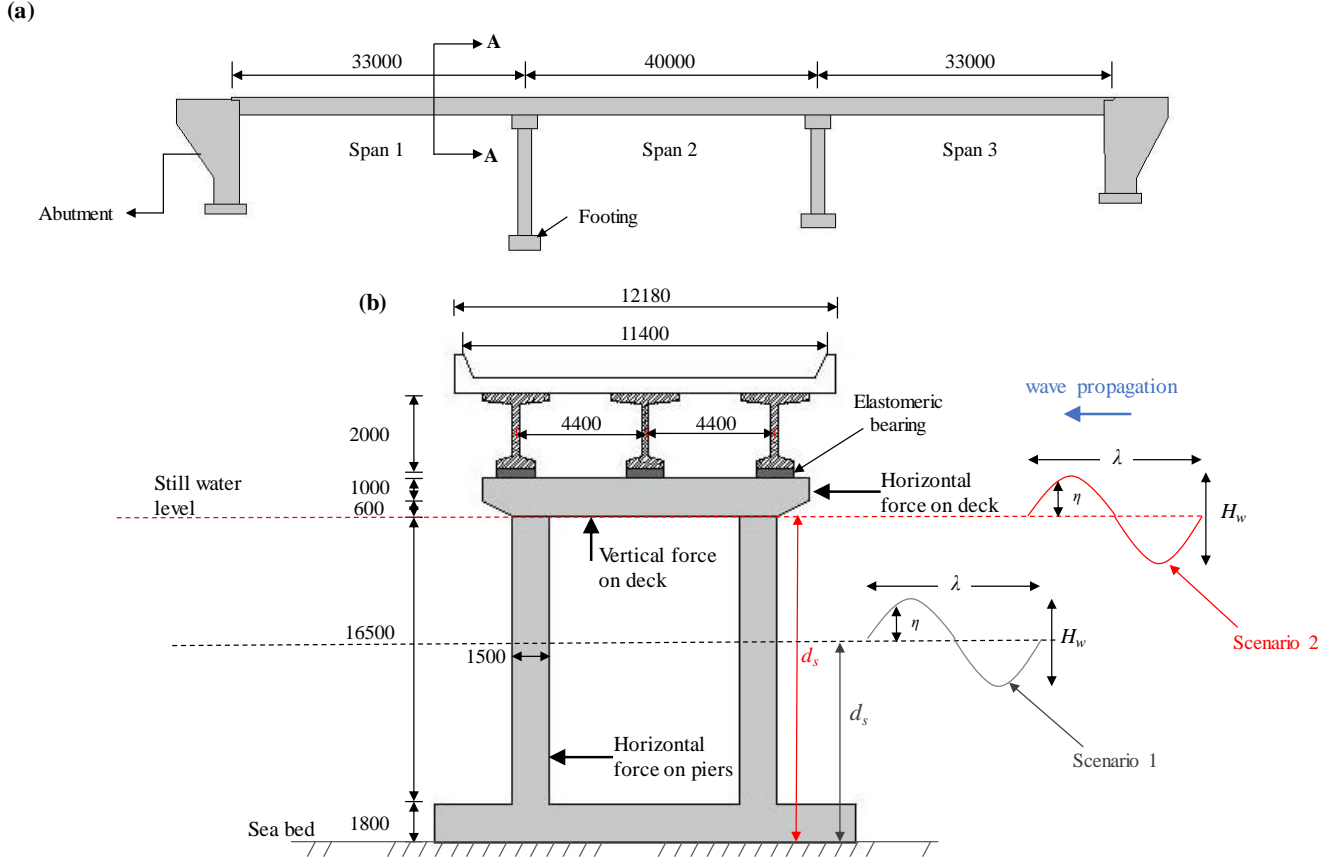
General configuration of the case study bridge showing (a) the elevation view, and (b) the section A-A view showing scenarios 1 and 2 (all dimensions are in mm)
